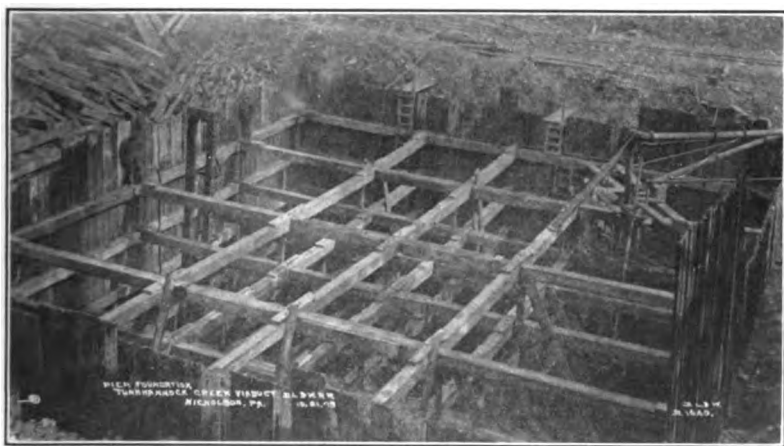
Tunkhannock viaduct. Steel sheet piling (partly driven) for inner cofferdam of piers, showing timber guide forms.
